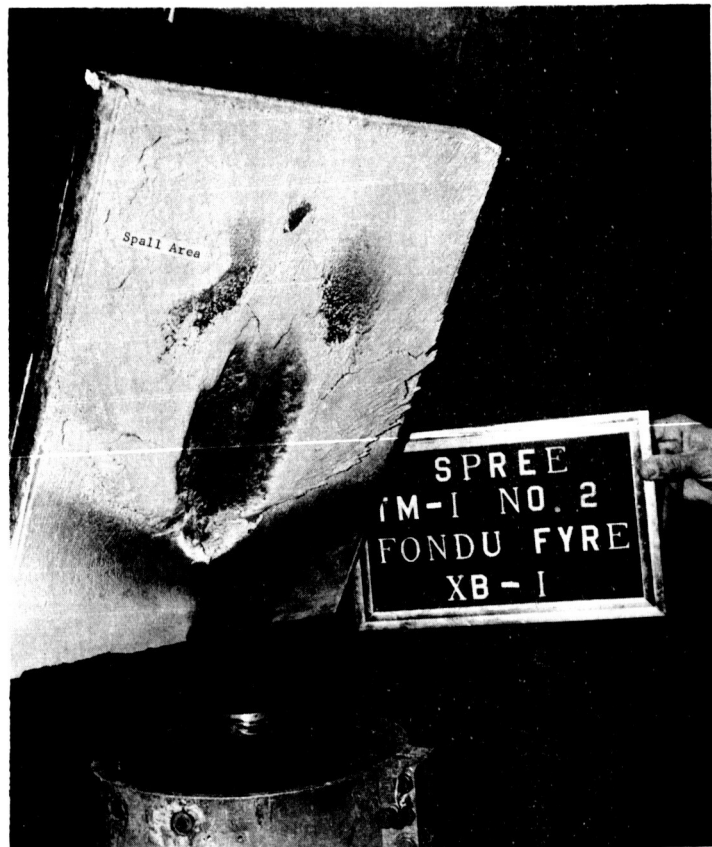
Spalled Fondu Fyre XB-1
